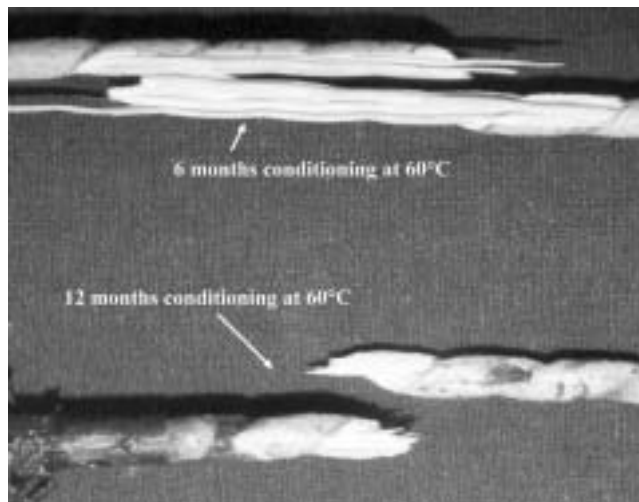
Failed specimen of conditioned GFRP reinforcing bars.
